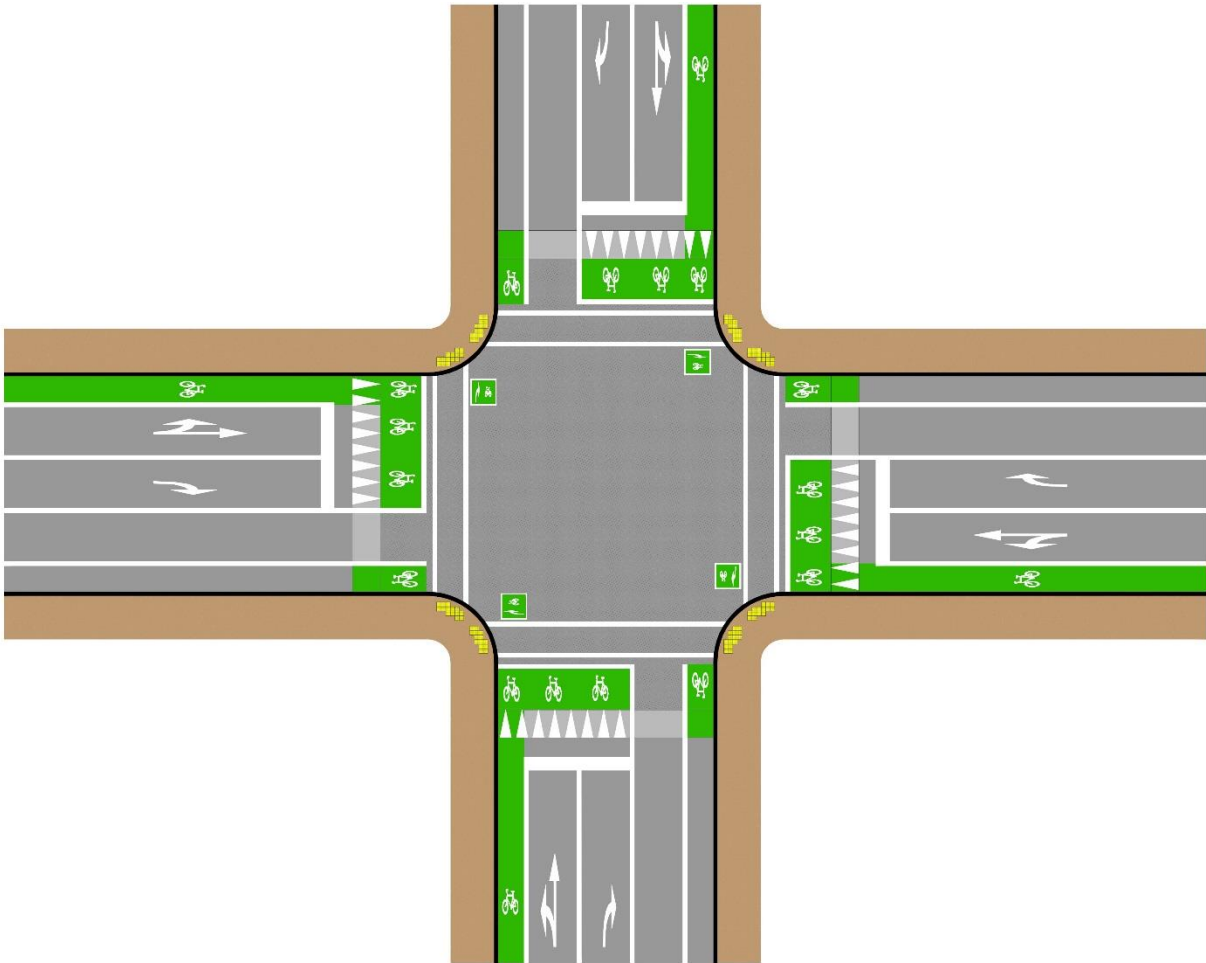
Example layouts for raised safety platforms at signalised intersections
